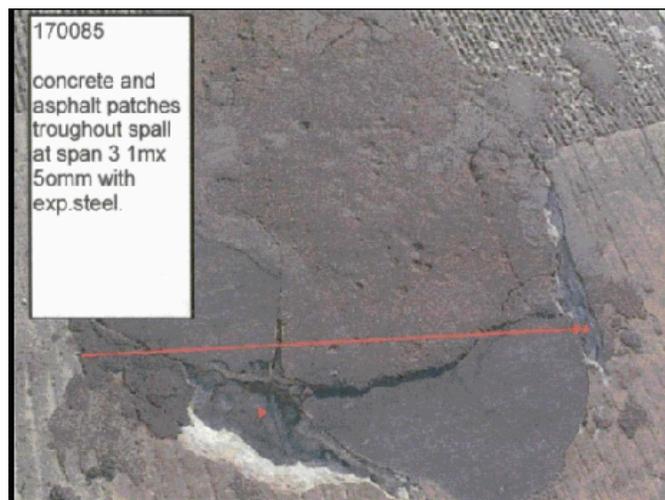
Deck Deficiency Six Months Before Failure, Bridge #170085
